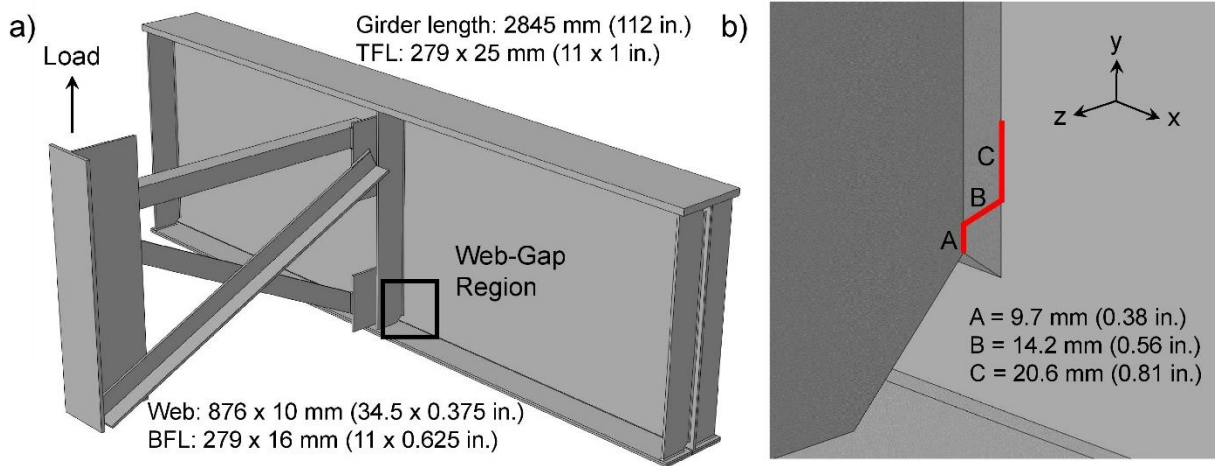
(a) Out-of-plane girder assembly; and (b) crack location and geometry.
